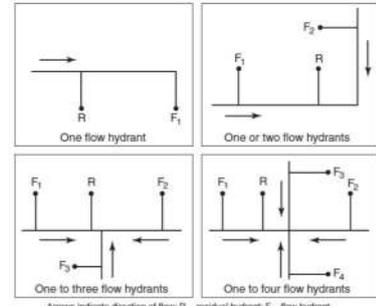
Suggested Test Layout for Hydrants.
